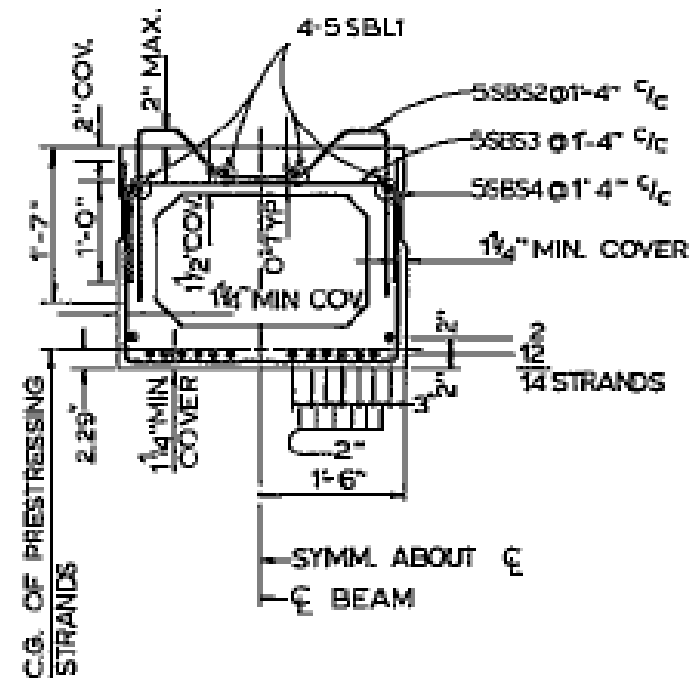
Design detailing of the 3ft.-wide beams (Beam 1 and Beam 2)
